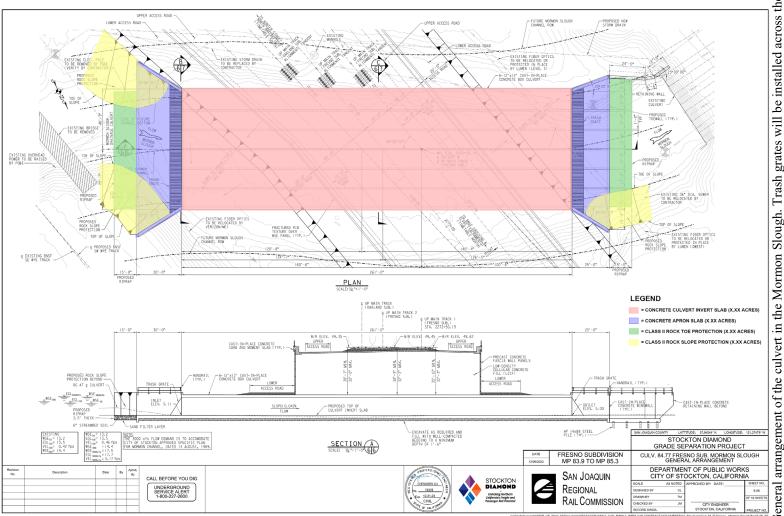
General arrangement of the culvert in the Mormon Slough. Trash grates will be installed across the entirety of the culvert on both ends with grates spaced 6 inches on-center. Rock slope protection (RSP) will be placed on slopes of the streambed adjacent to the culvert, and riprap armor will be required at the base of the culvert footing to prevent scour (HDR 2024).
